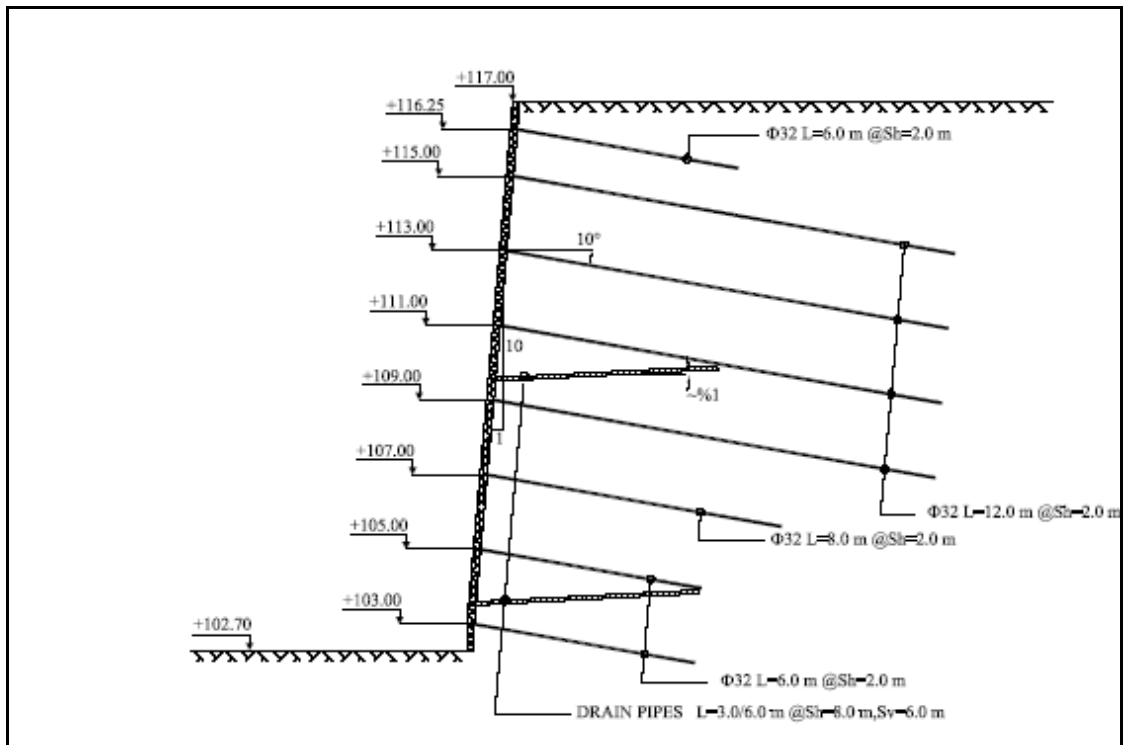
Case No. 6 – Besler Warehouse, detailed cross-section of inclinometer 1
